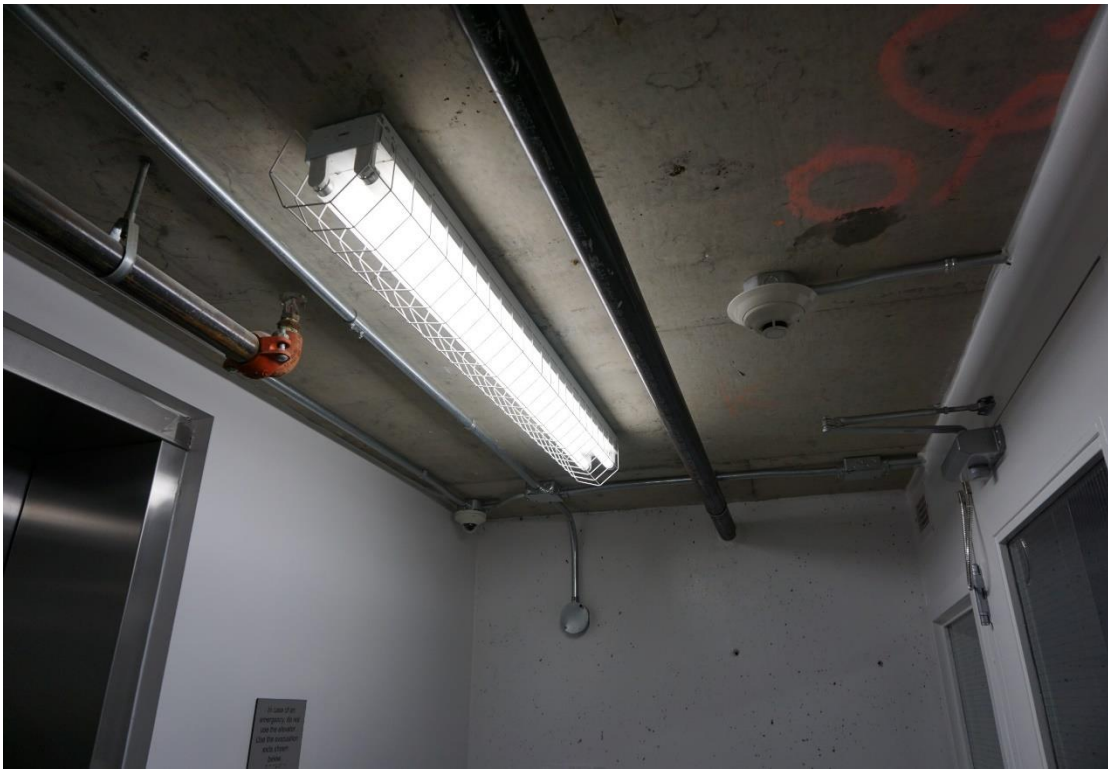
Ceiling mounted fluorescent light fixture with metal cage in the parkade.
